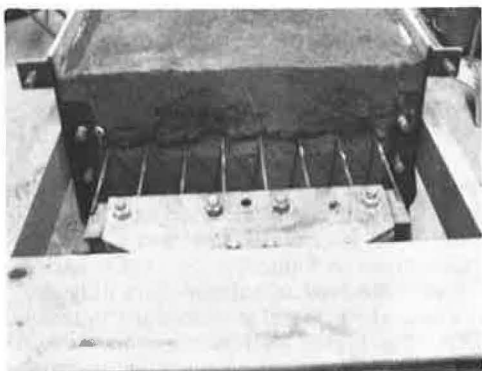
Failure in specimen with three steel-strip reinforcement for test 10.
